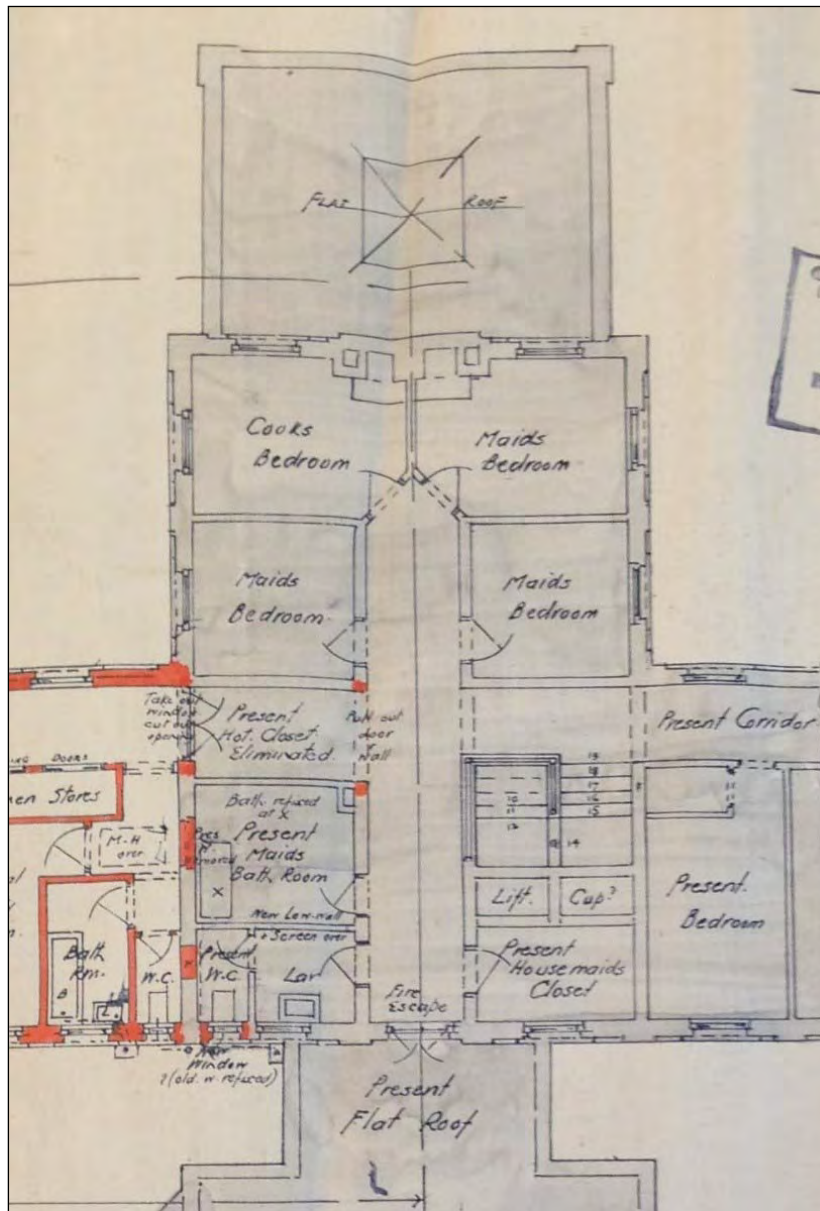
West wing of original building at first-floor level (WYAS: Wakefield WMT/CA/4171, plan 2).
